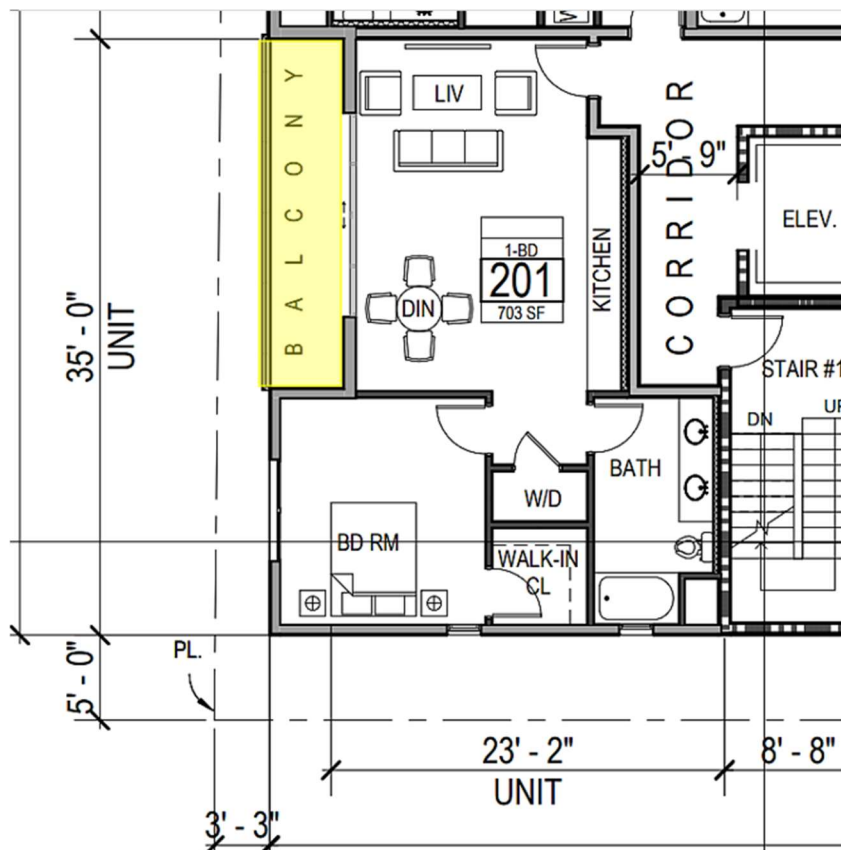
Annotated, excerpted plan of proposed project second floor, Unit 201, showing balcony in yellow that would project outboard of the building façade, as would the canopies. The proposed balcony deck in yellow would also be the required “canopy” which presents a problem. Source: Second Floor Plan, sheet A3-2.
